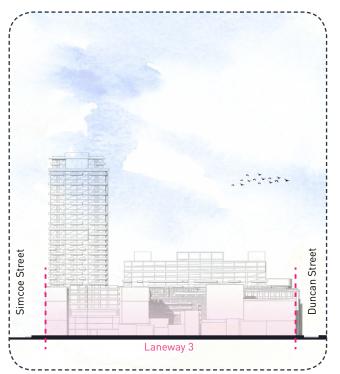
Enlarged Site Section A.A; 1:1,800 2006-2013, section
